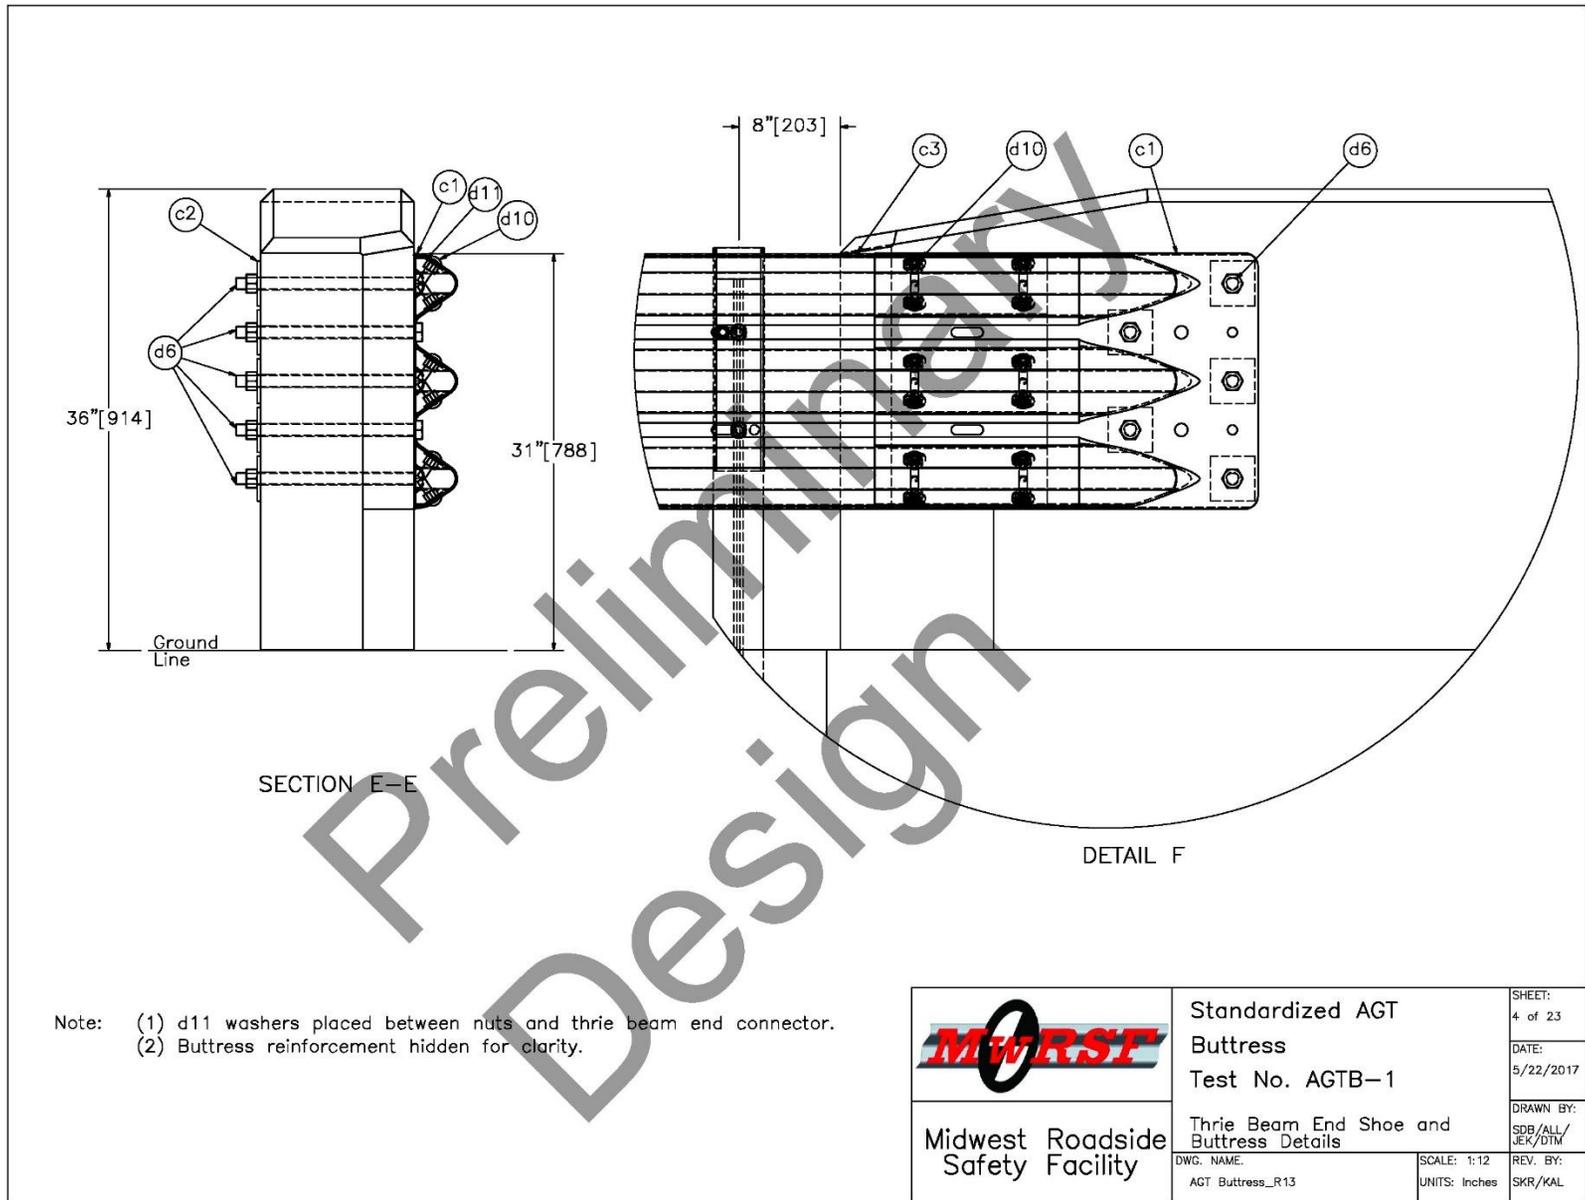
Thrie Beam Terminal Connector and Buttress Details, Test No. AGTB-1
